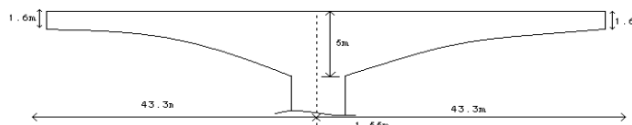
The typical balanced cantilever segment in Burri Bridge[22]
